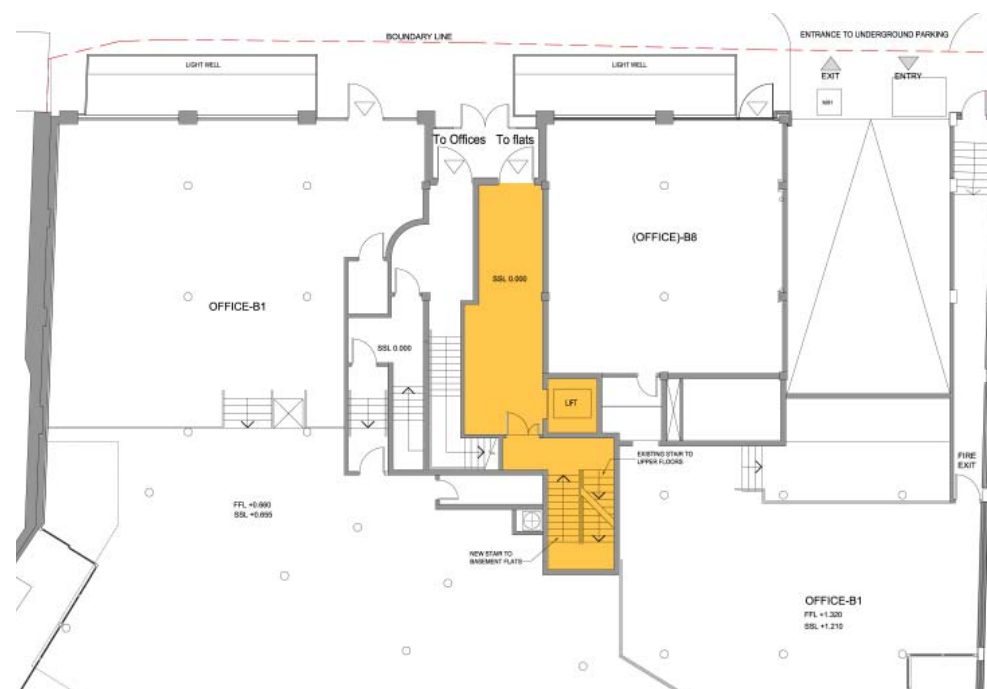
Ground floor plan showing residents entrance foyer and new stairs down to upper basement level
